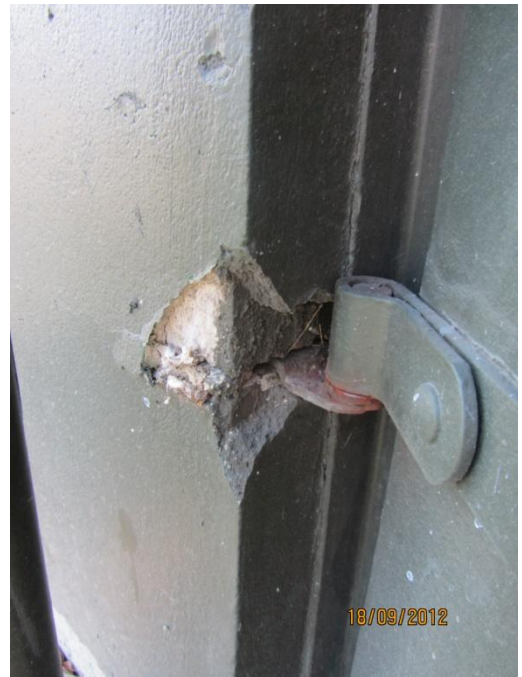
Close up view of the bottom hinge for the womens toilet door showing the missing plaster material
